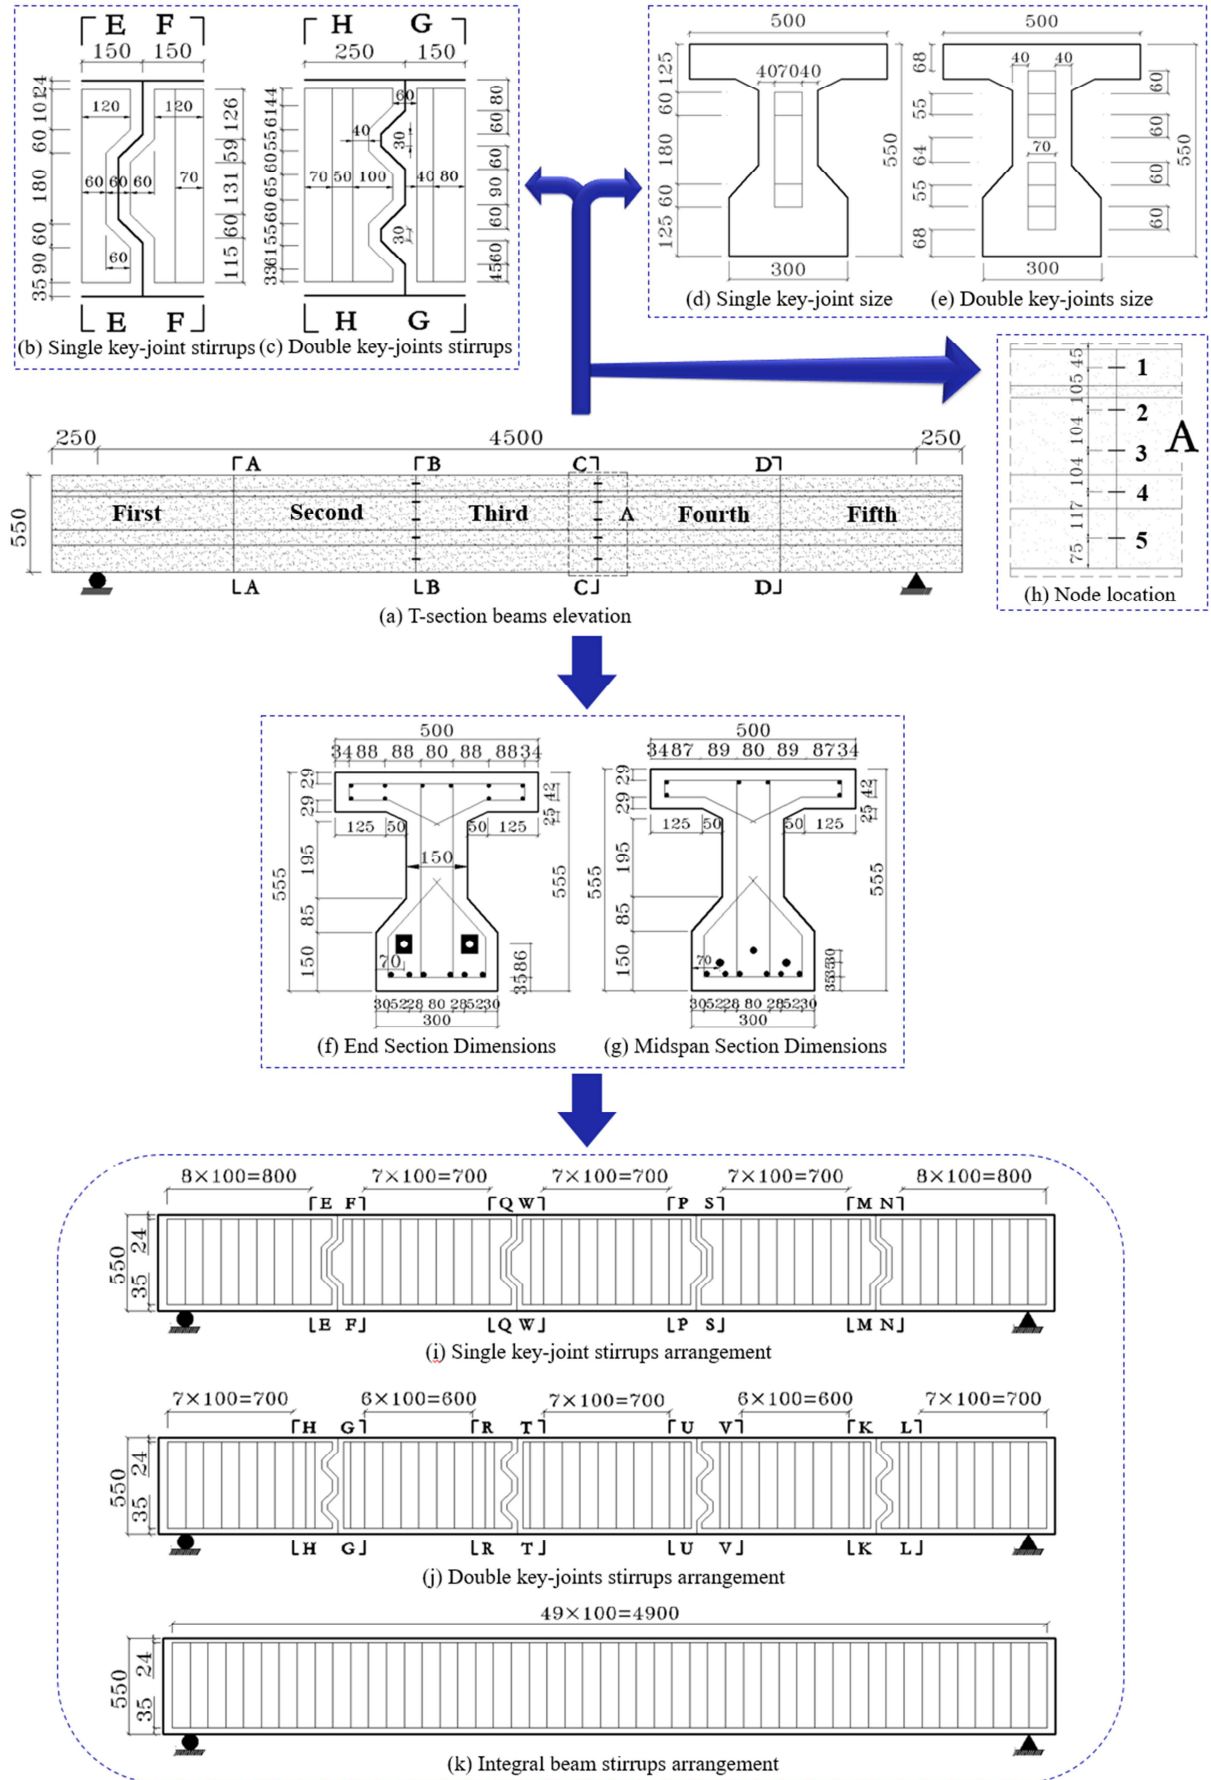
Segmental prefabricated concrete T-section beams (mm).
